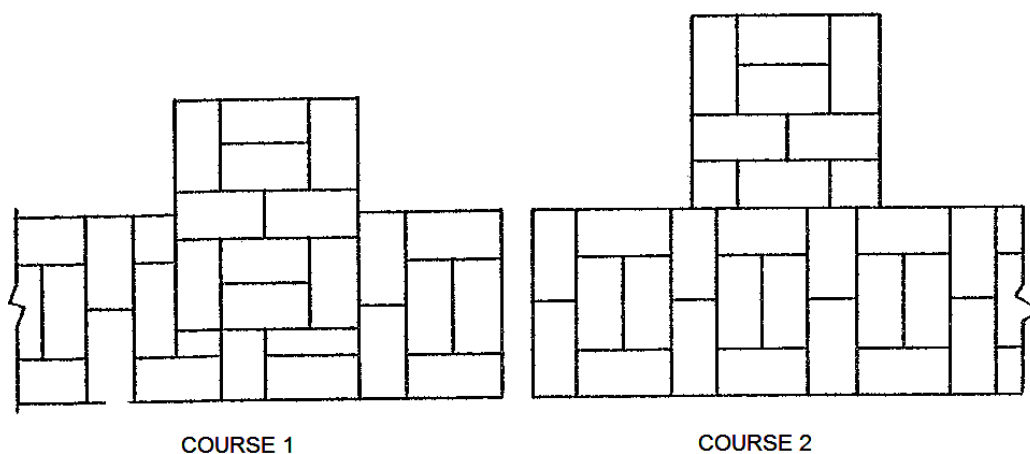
Alternate plan courses of a stopped intersection in two-brick walling
